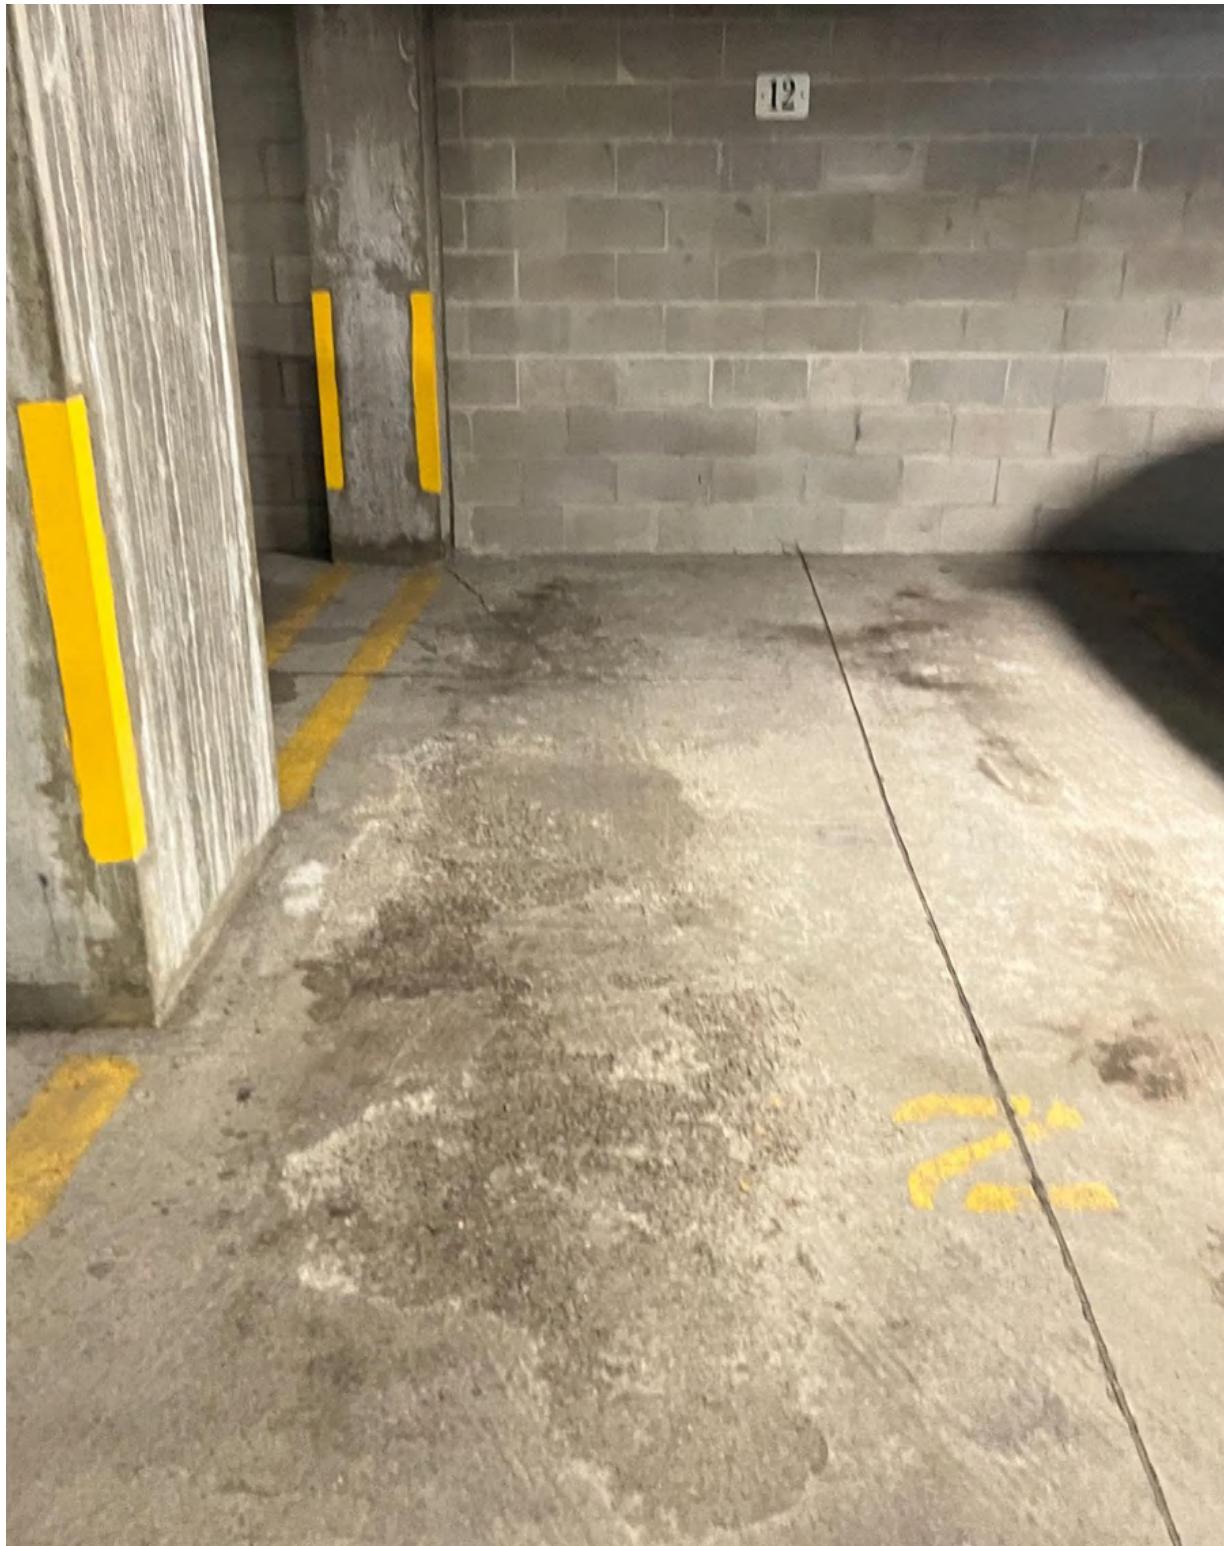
shallow concrete surface delamination at lower level garage parking stall
